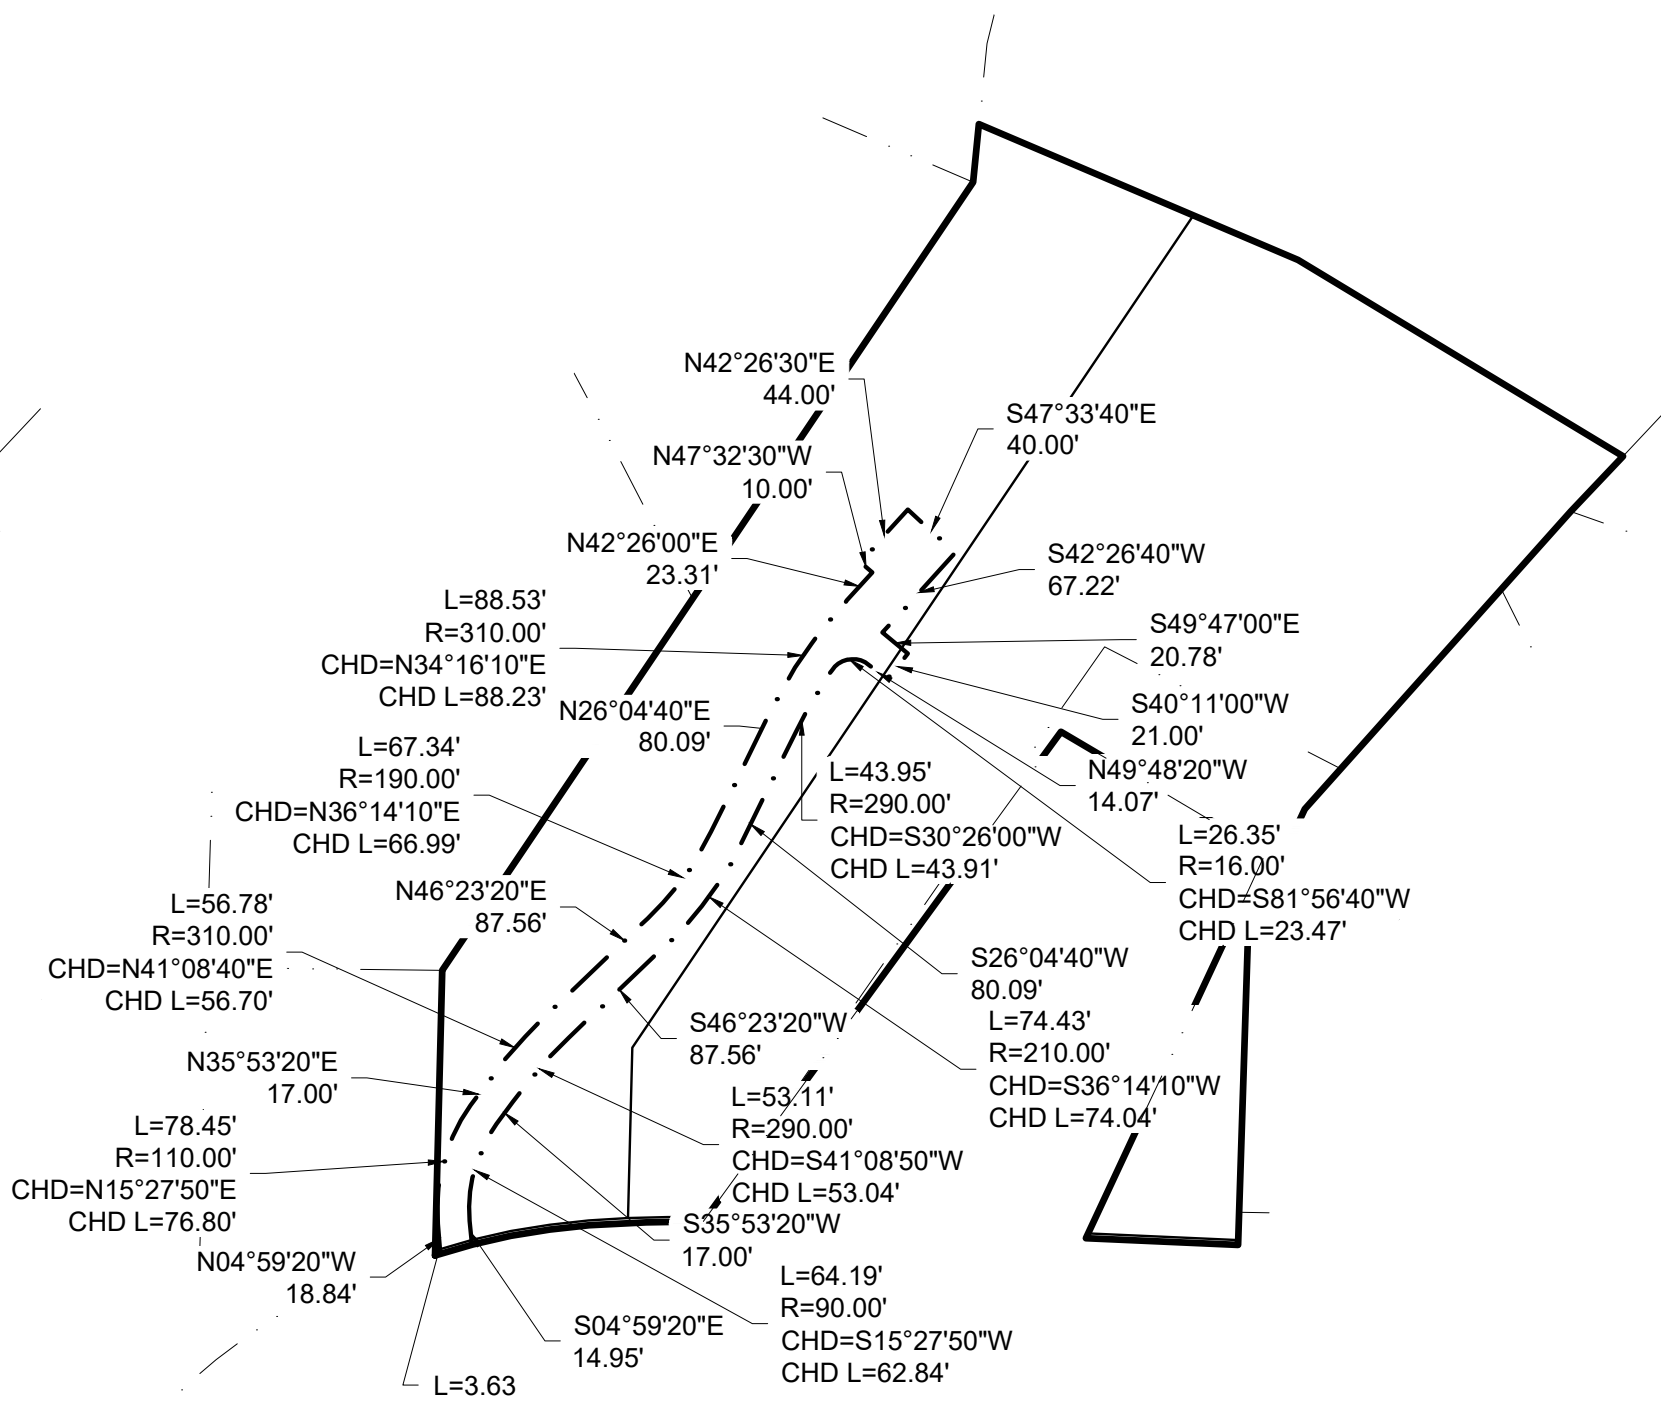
DETAIL 'C' - SEWER EASEMENT - BK 1876 PG 409
